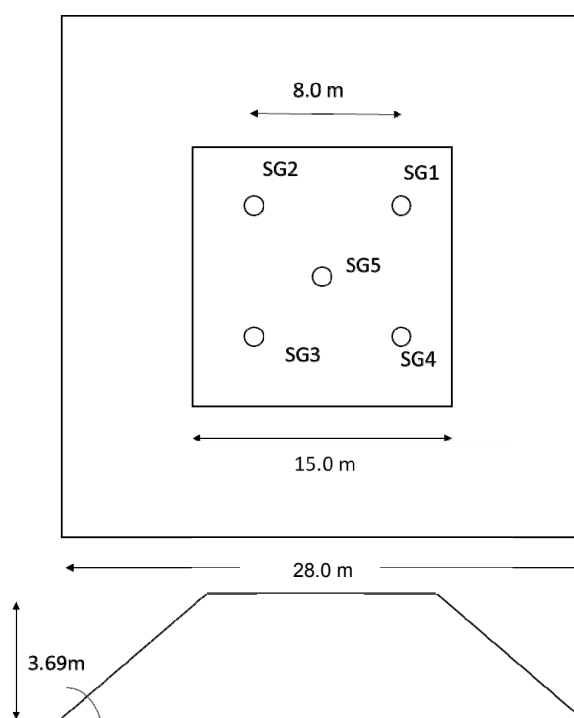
Plan arrangement of the settlement plates and typical cross section.
